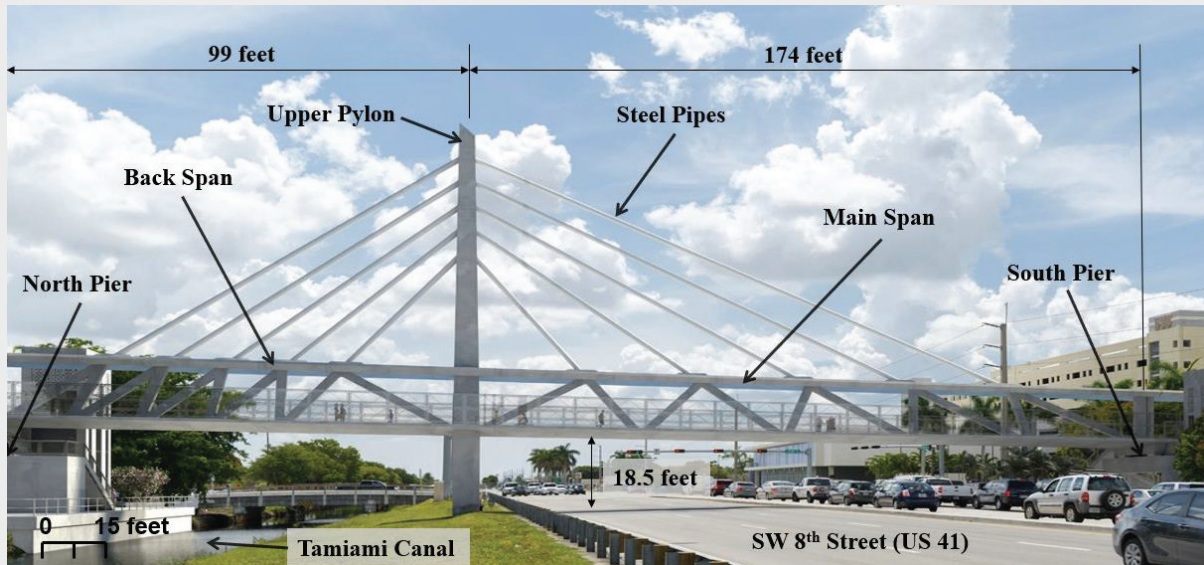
Rendering of what the signature pedestrian bridge would look like when completed looking to the east (Source: NTSB Factual Report)
